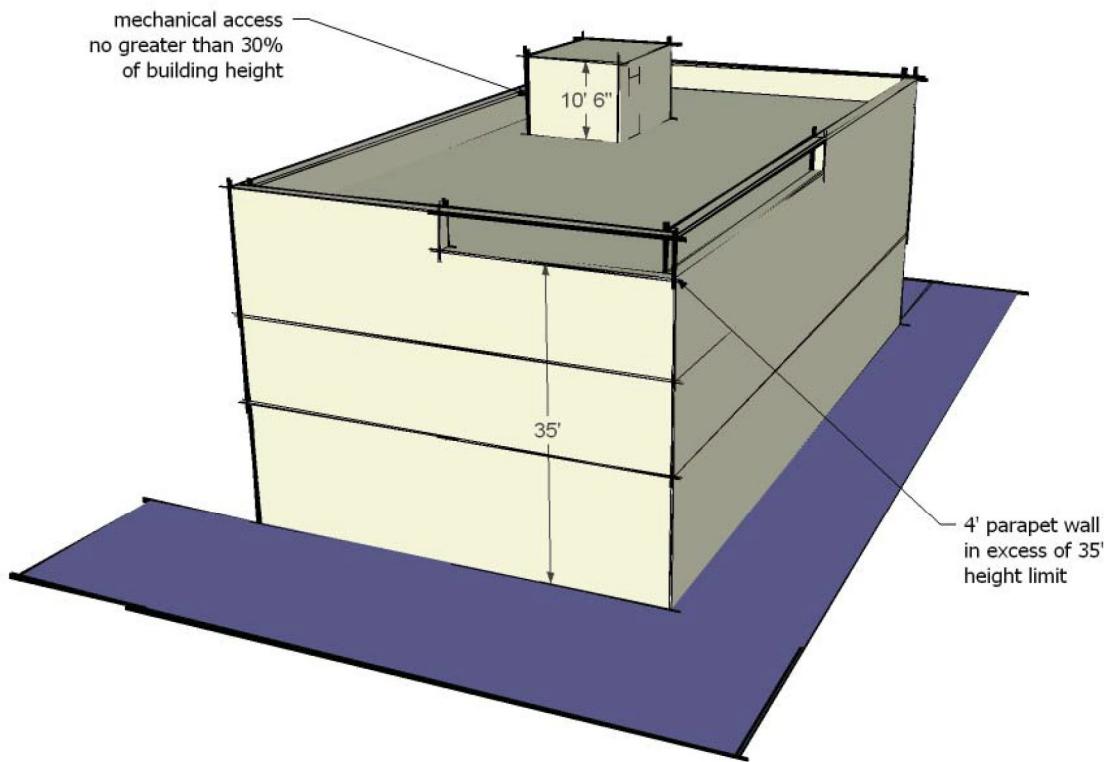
Scenario one - 35 foot building height including parapet walls and mechanical access
